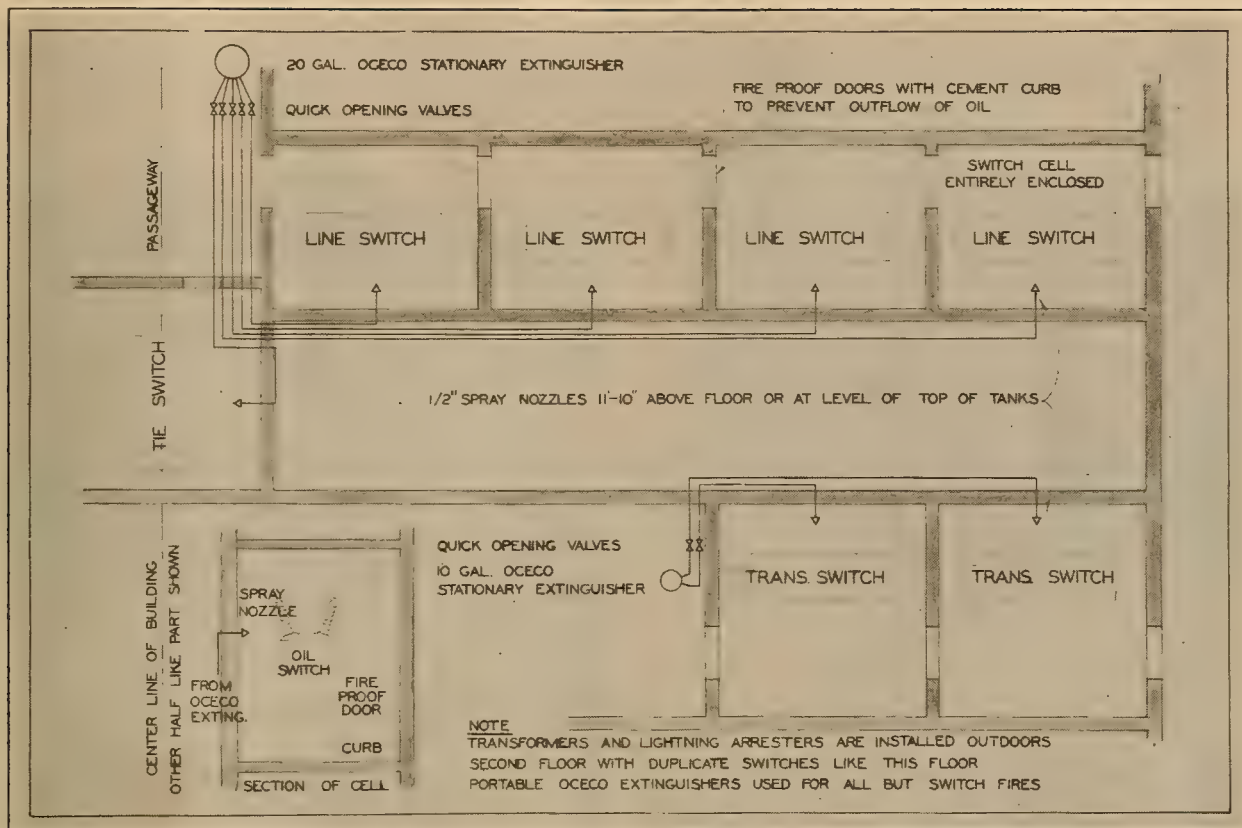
Diagram showing schematically the arrangement of the built-in fire fighting equipment installed in the new switch house.
